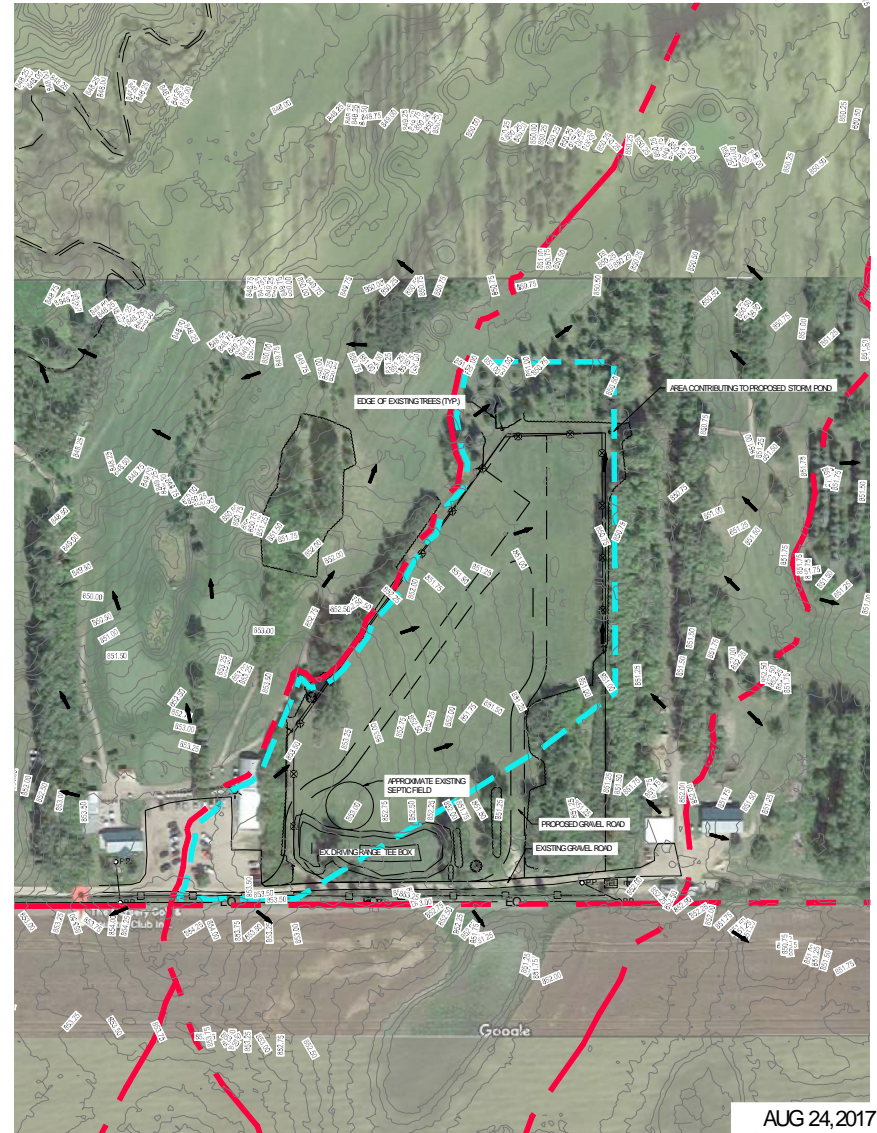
CONCEPTUAL RV PARK LAYOUT
